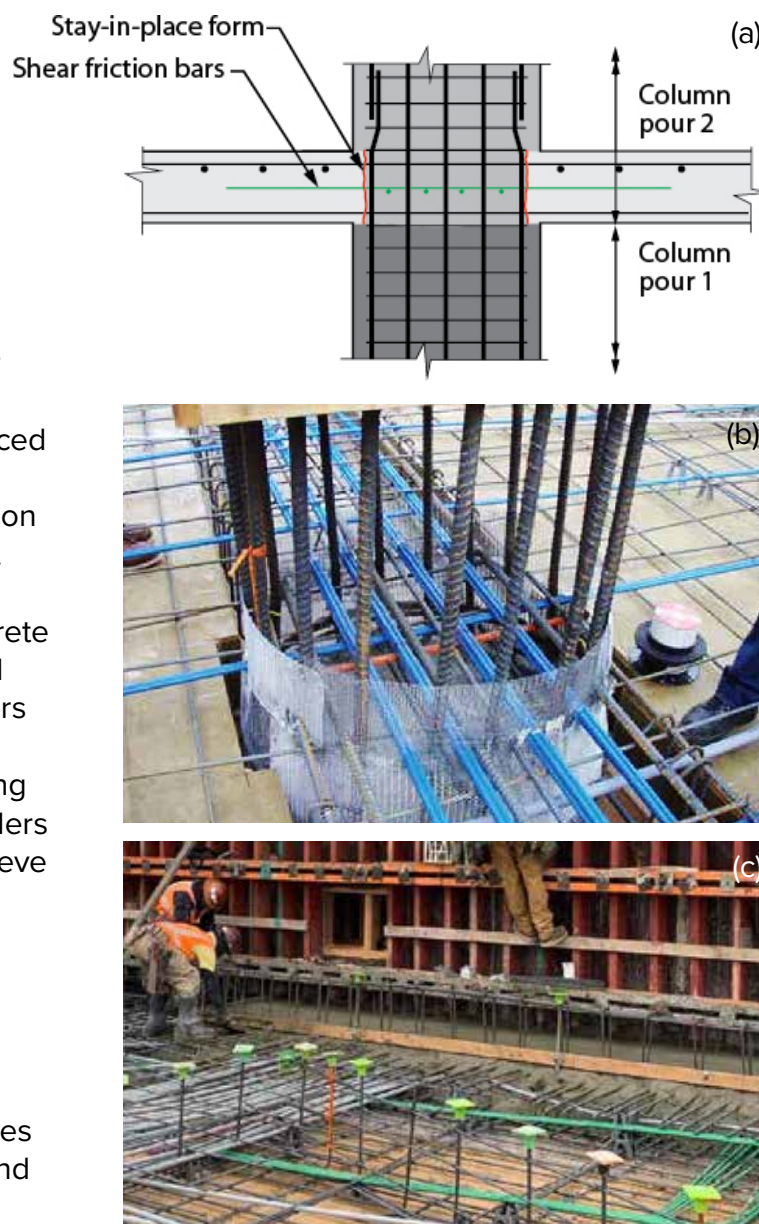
Stay-in-place forms can be used to confine higher-strength concrete where it is needed, in the core columns and walls: (a) schematic of column application (image courtesy of CKC Structural Engineers); (b) photo of stay-in-place form at a column (photo courtesy of CKC Structural Engineers); and (c) a high-strength concrete puddle at a wall is confined by a stay-in-place form (located at vertical reinforcement for a future curb and outside the wall plane) (image courtesy of Related).
